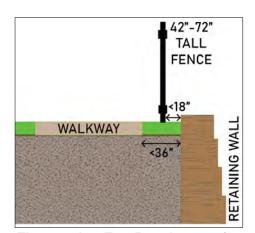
A-2-E-1: Requirement for fence when retaining wall is adjacent to walkway.
